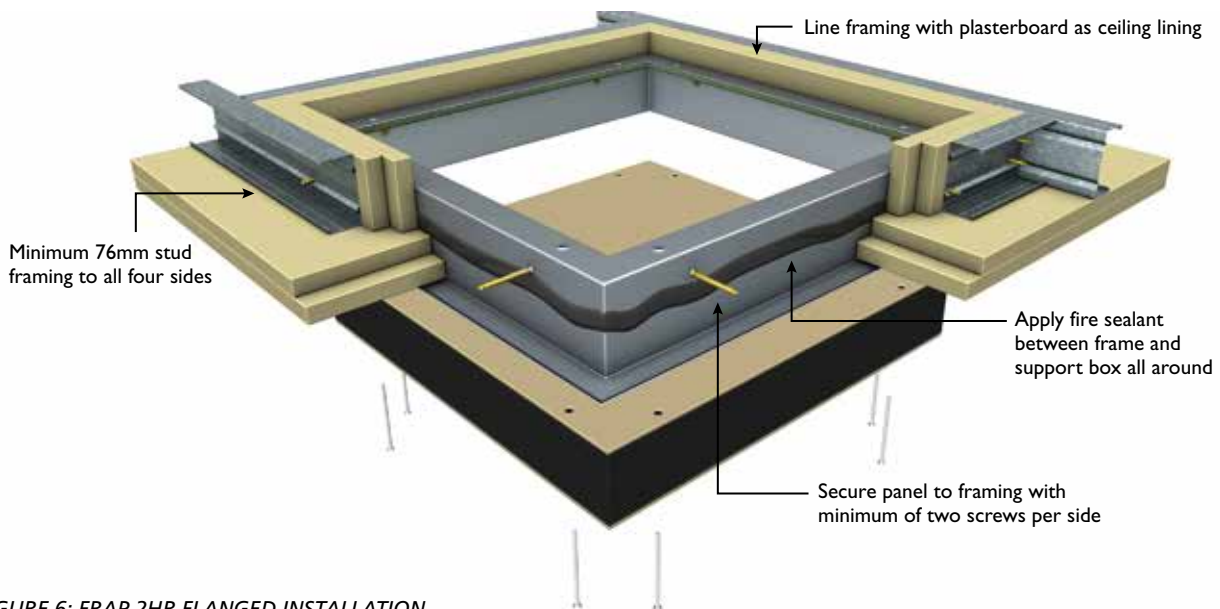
FRAP 2HR FLANGED INSTALLATION
